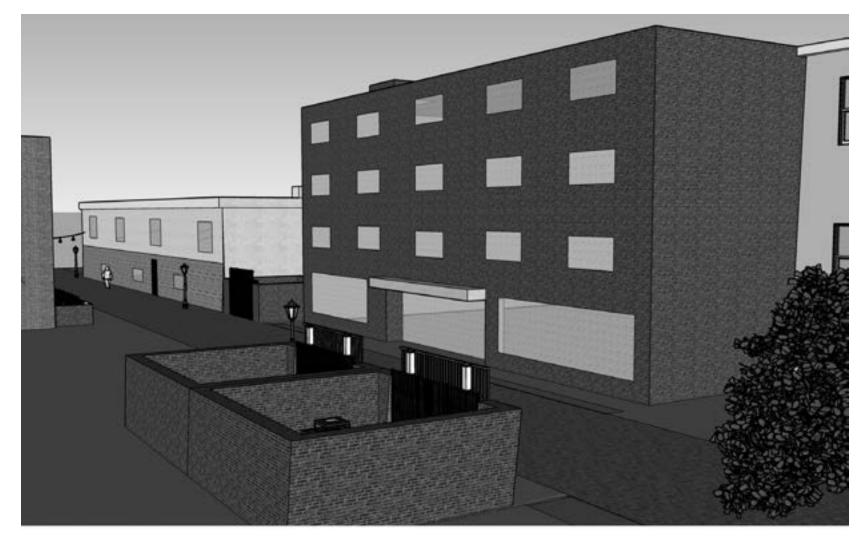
West facing perspective view of alley 13's proposed waste consolidation and infill in the place of parking lot
